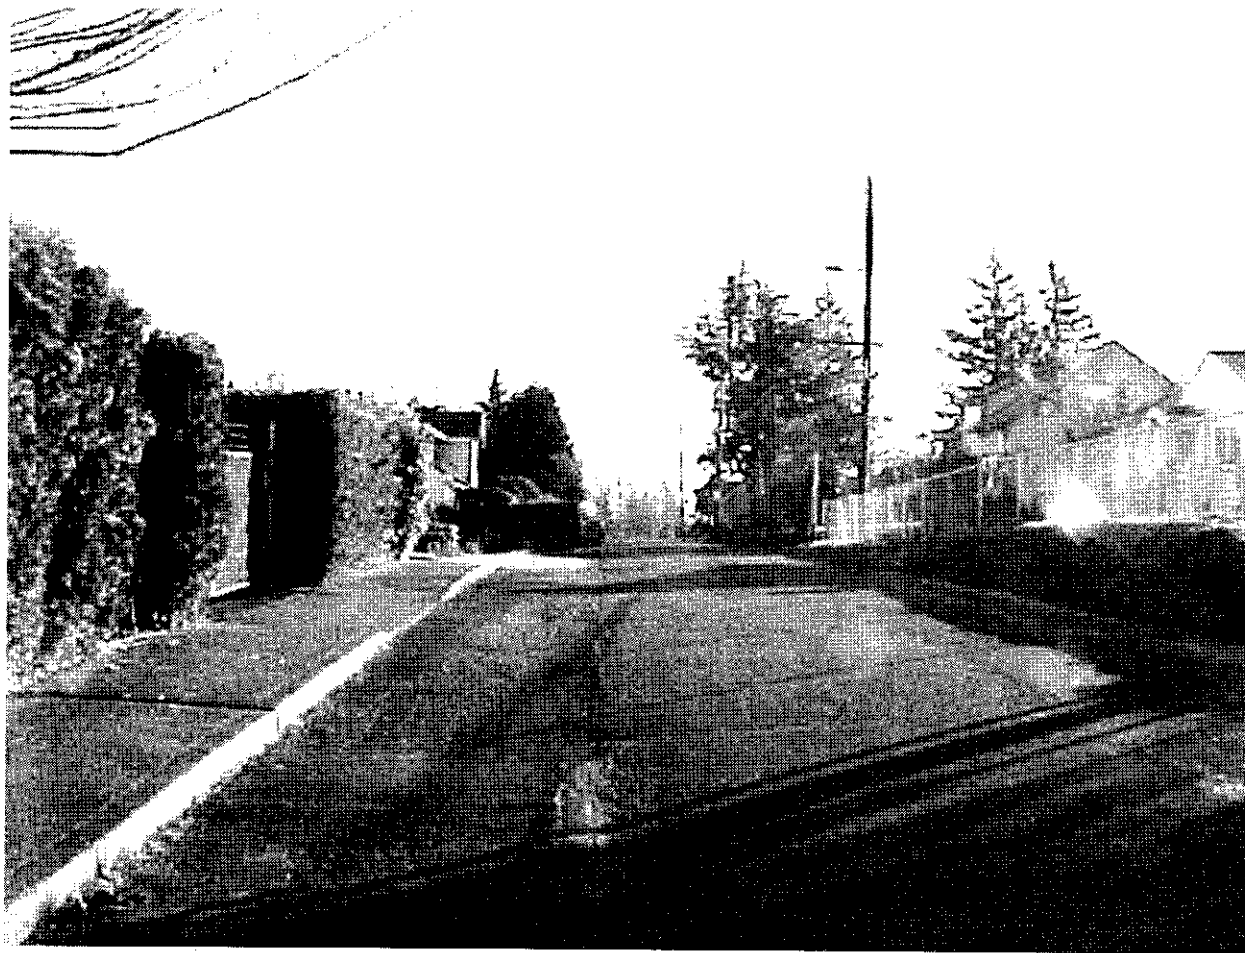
Looking East along Dewey Street from the intersection of Dewey and Molalla Avenue
